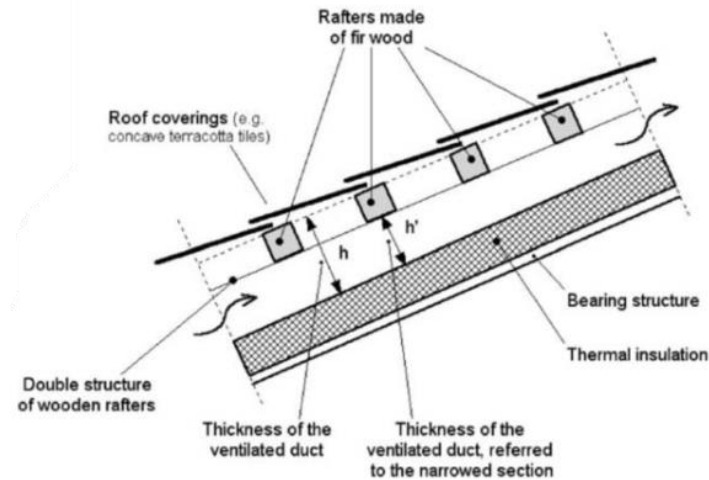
Typical section of ventilated roof system (from Ciampi et al. (2005))
